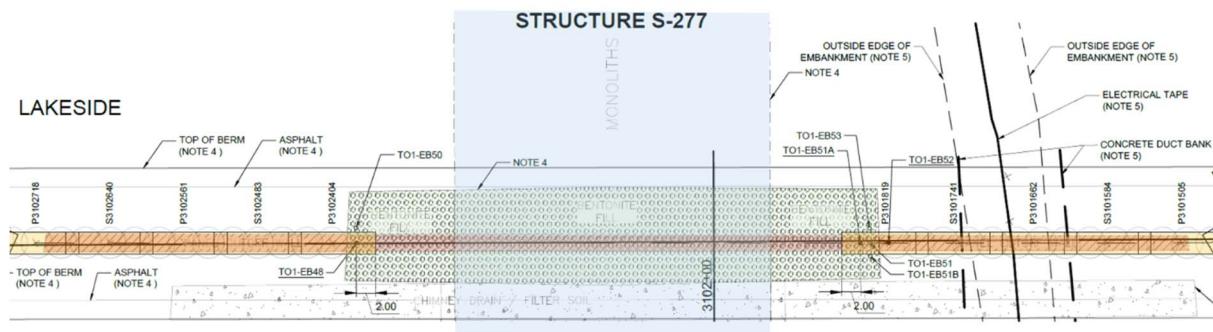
Plan view of structure connection with culvert barrels (blue), soil-bentonite core (green), existing cutoff wall (red) and new cutoff wall (yellow), from BFC shop drawings.
